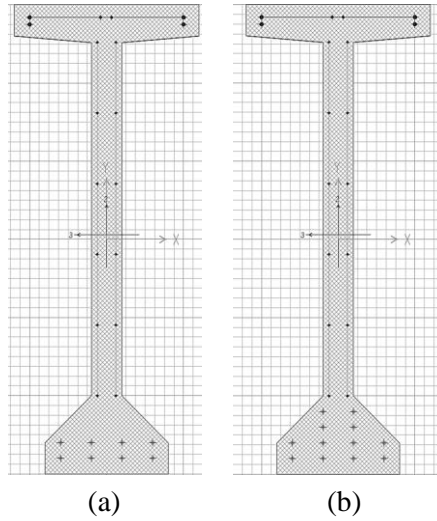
(a) SD External beam section. (b) SD Internal beam section.
